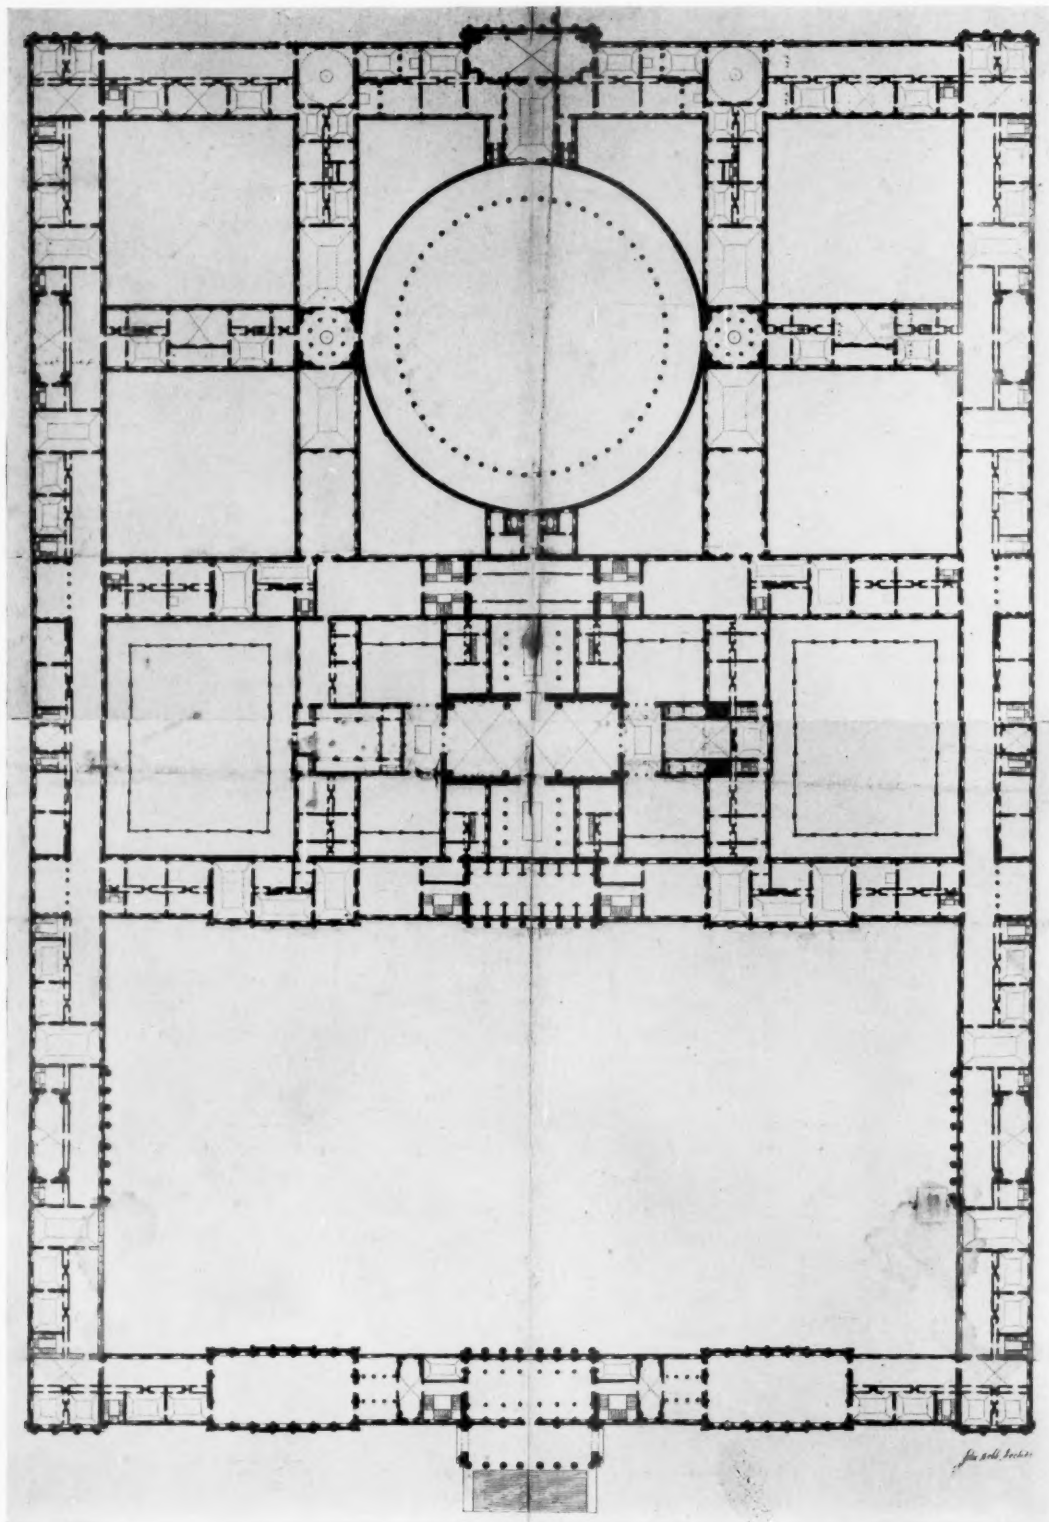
GROUND-FLOOR PLAN OF ANOTHER DESIGN, SIGNED BY JOHN WEBB
